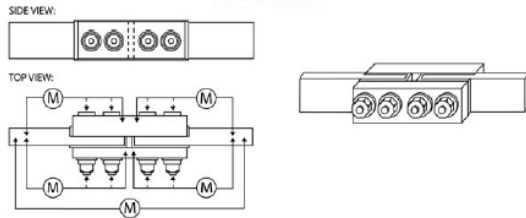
(b)- 2: Gauge Plate – Flat Insulating Plate Style
